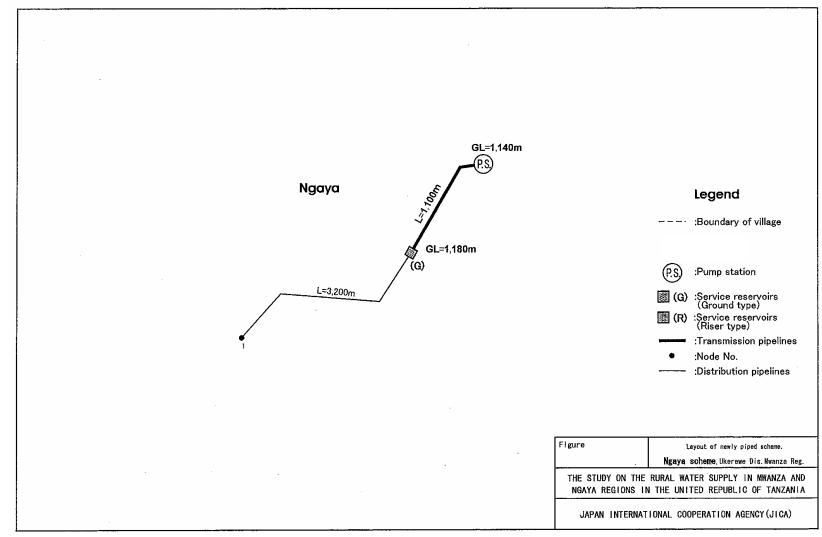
Layout of Newly Installed Piped Scheme (Ngaya Scheme)
